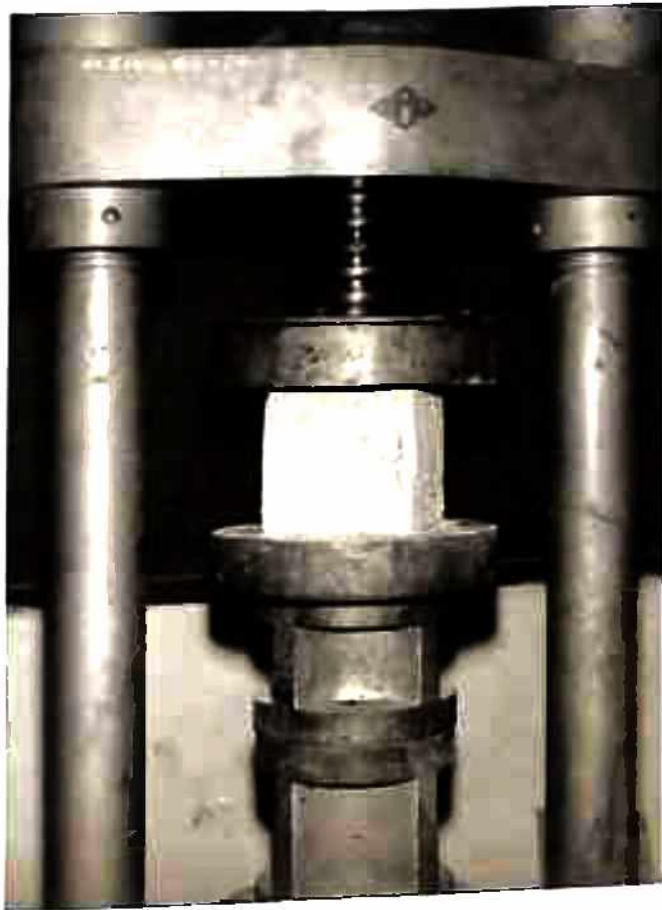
SAN FIBRE REINFORCED CONCRETE CUBE
